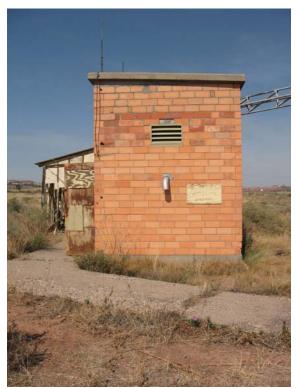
AOC 64, Building 510, looking west at exterior condition of building.
